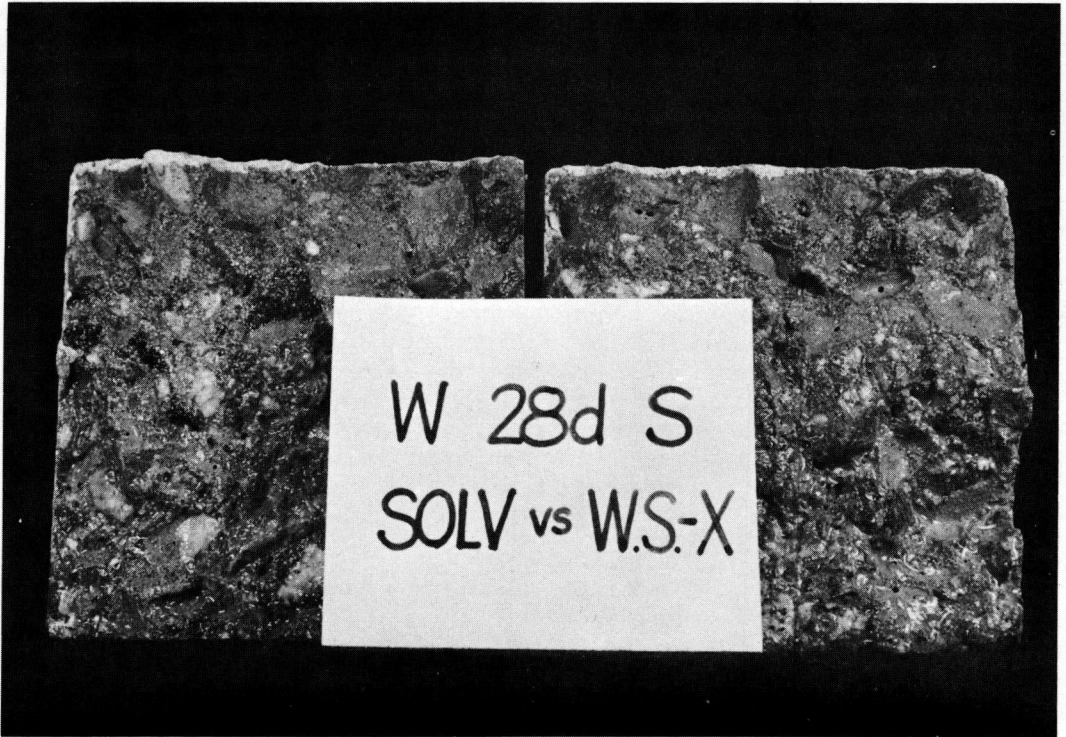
Same as Figure 7 except concrete cured 28 days. Left beam in both figures was wood floated; right beam steel trowelled.
